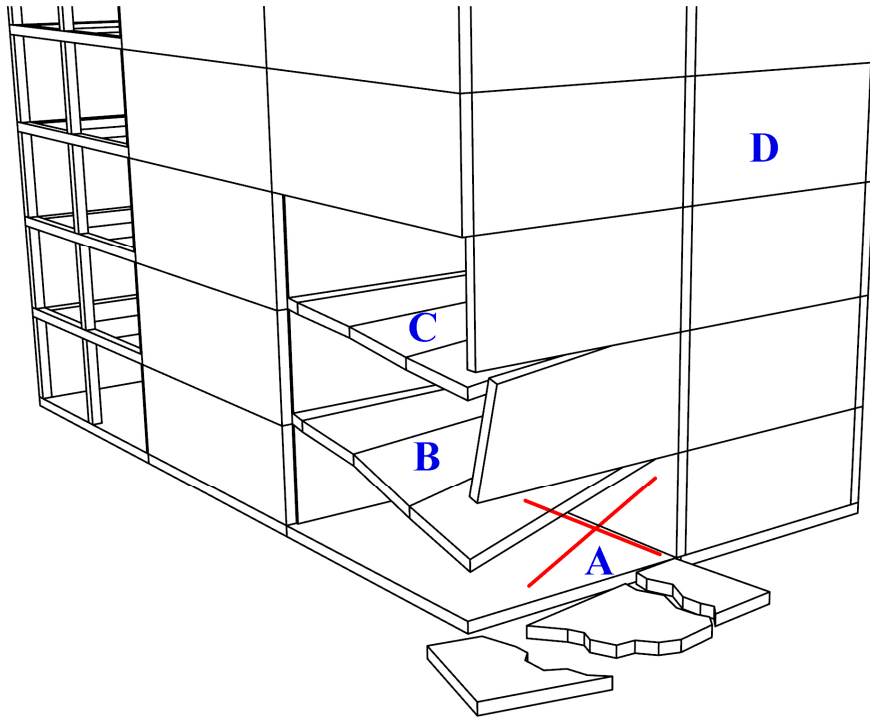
Zones in a damaged building due to accidental load. Area for primary damage caused by accidental load, zone A. Secondary damage area with severe risk of personal injury, zone B. Area with large permanent deformations but with insignificant risk of personal injury, zone C. Area where the construction largely remains unaffected by the accidental load and the primary damage, zone D.
